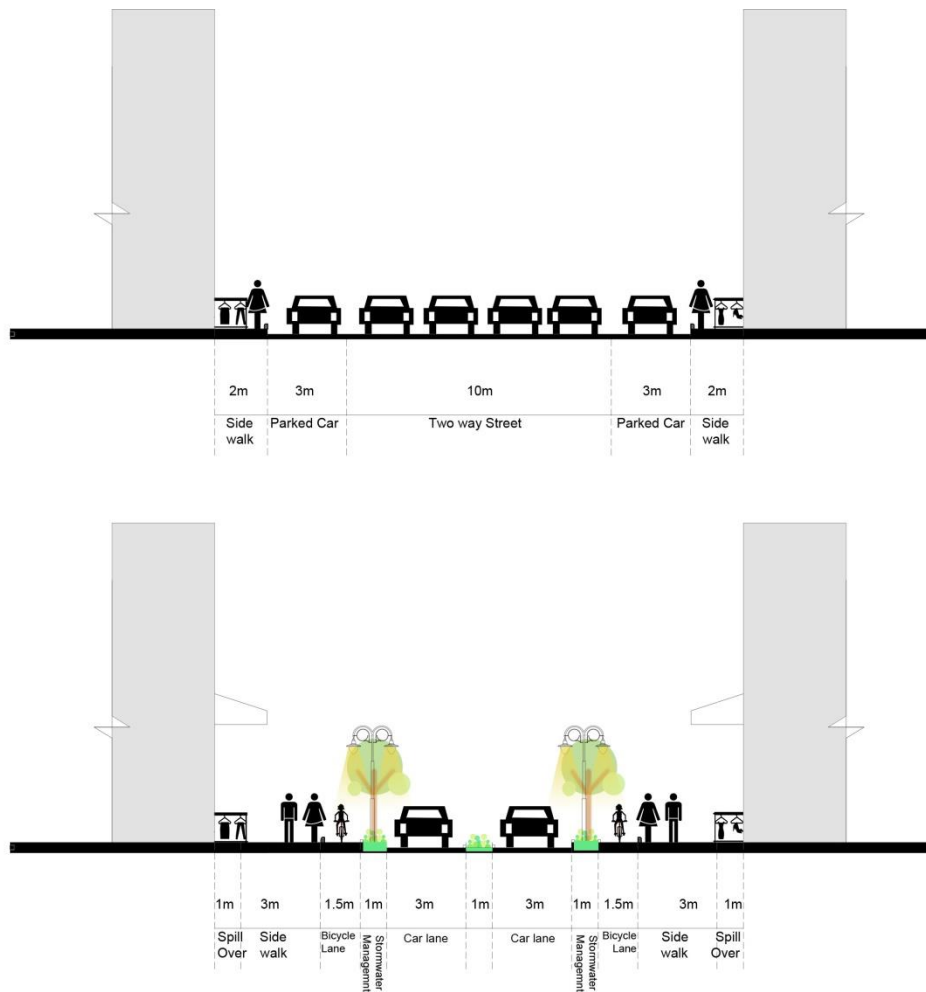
Before and after of the street section (Secondary artery). Source: Author.
